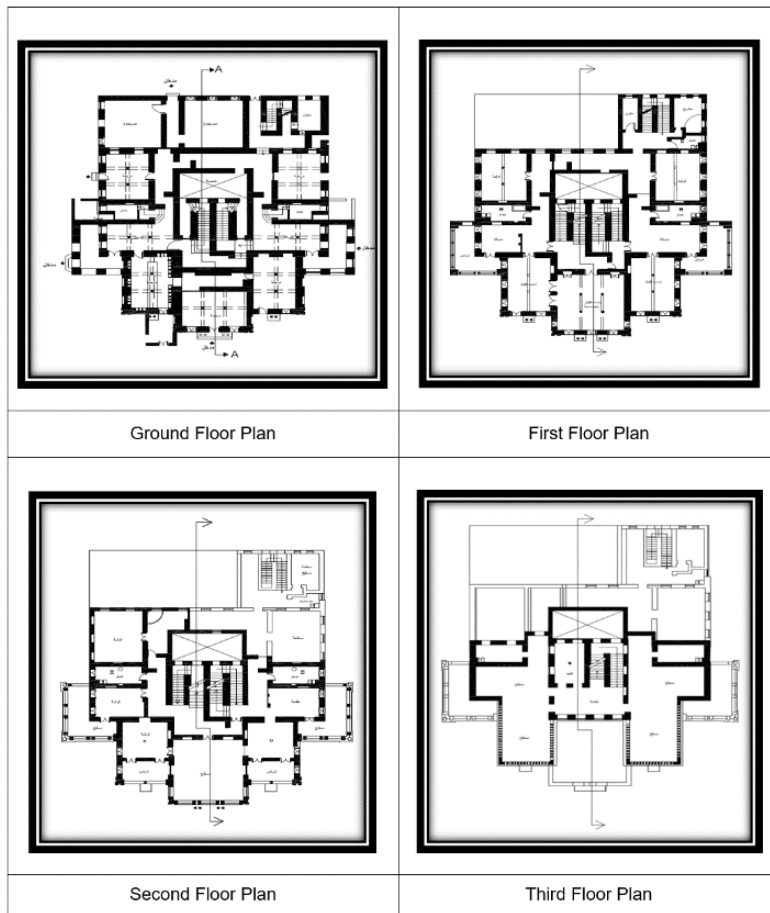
One of the luxurious and distinctive mud buildings, the students documented the building, details, and design (it was demolished latterly).
